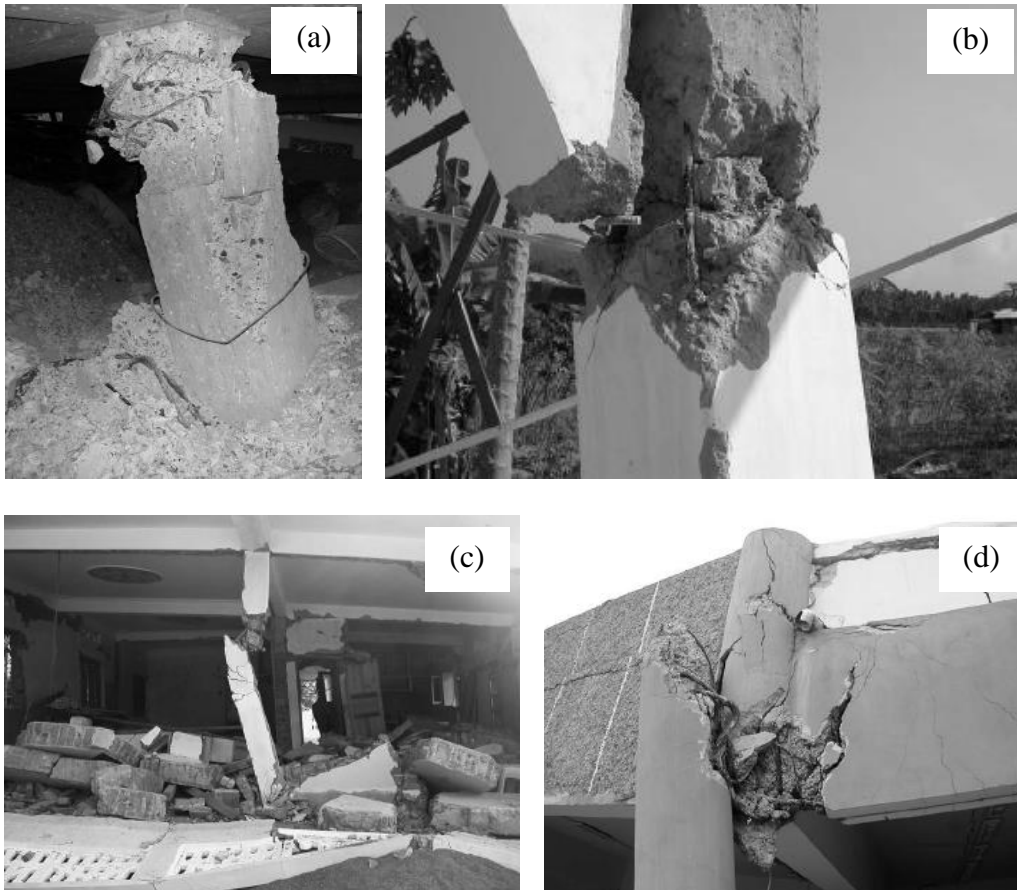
Columns failure in RC buildings due to poor shear design during 2004 Sumatra Earthquake and Tsunami; (a), (b) and (c) buckling of longitudinal bars due to 90° hooks opened up and (d) shear failure of column at beam-columns joint (Kaushik and Jain, 2007)
